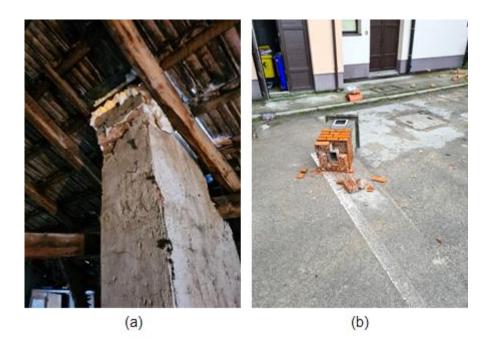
(a) Damaged chimney, (b) chimney fallen on the street (source: Nenad Bijelić and Damir Lazarević).
